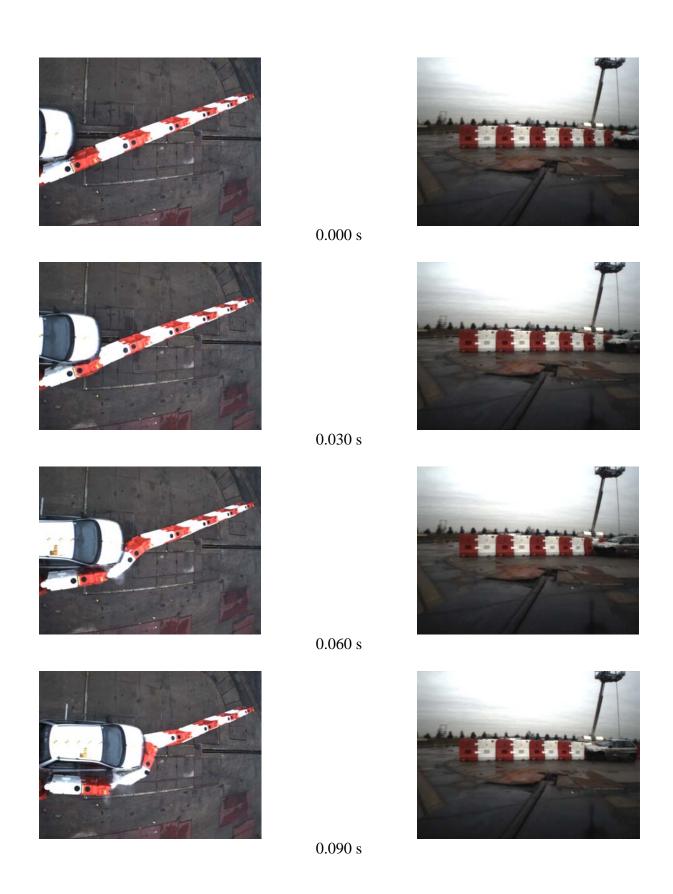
Sequential photographs for test 061221 (overhead and perpendicular views).
